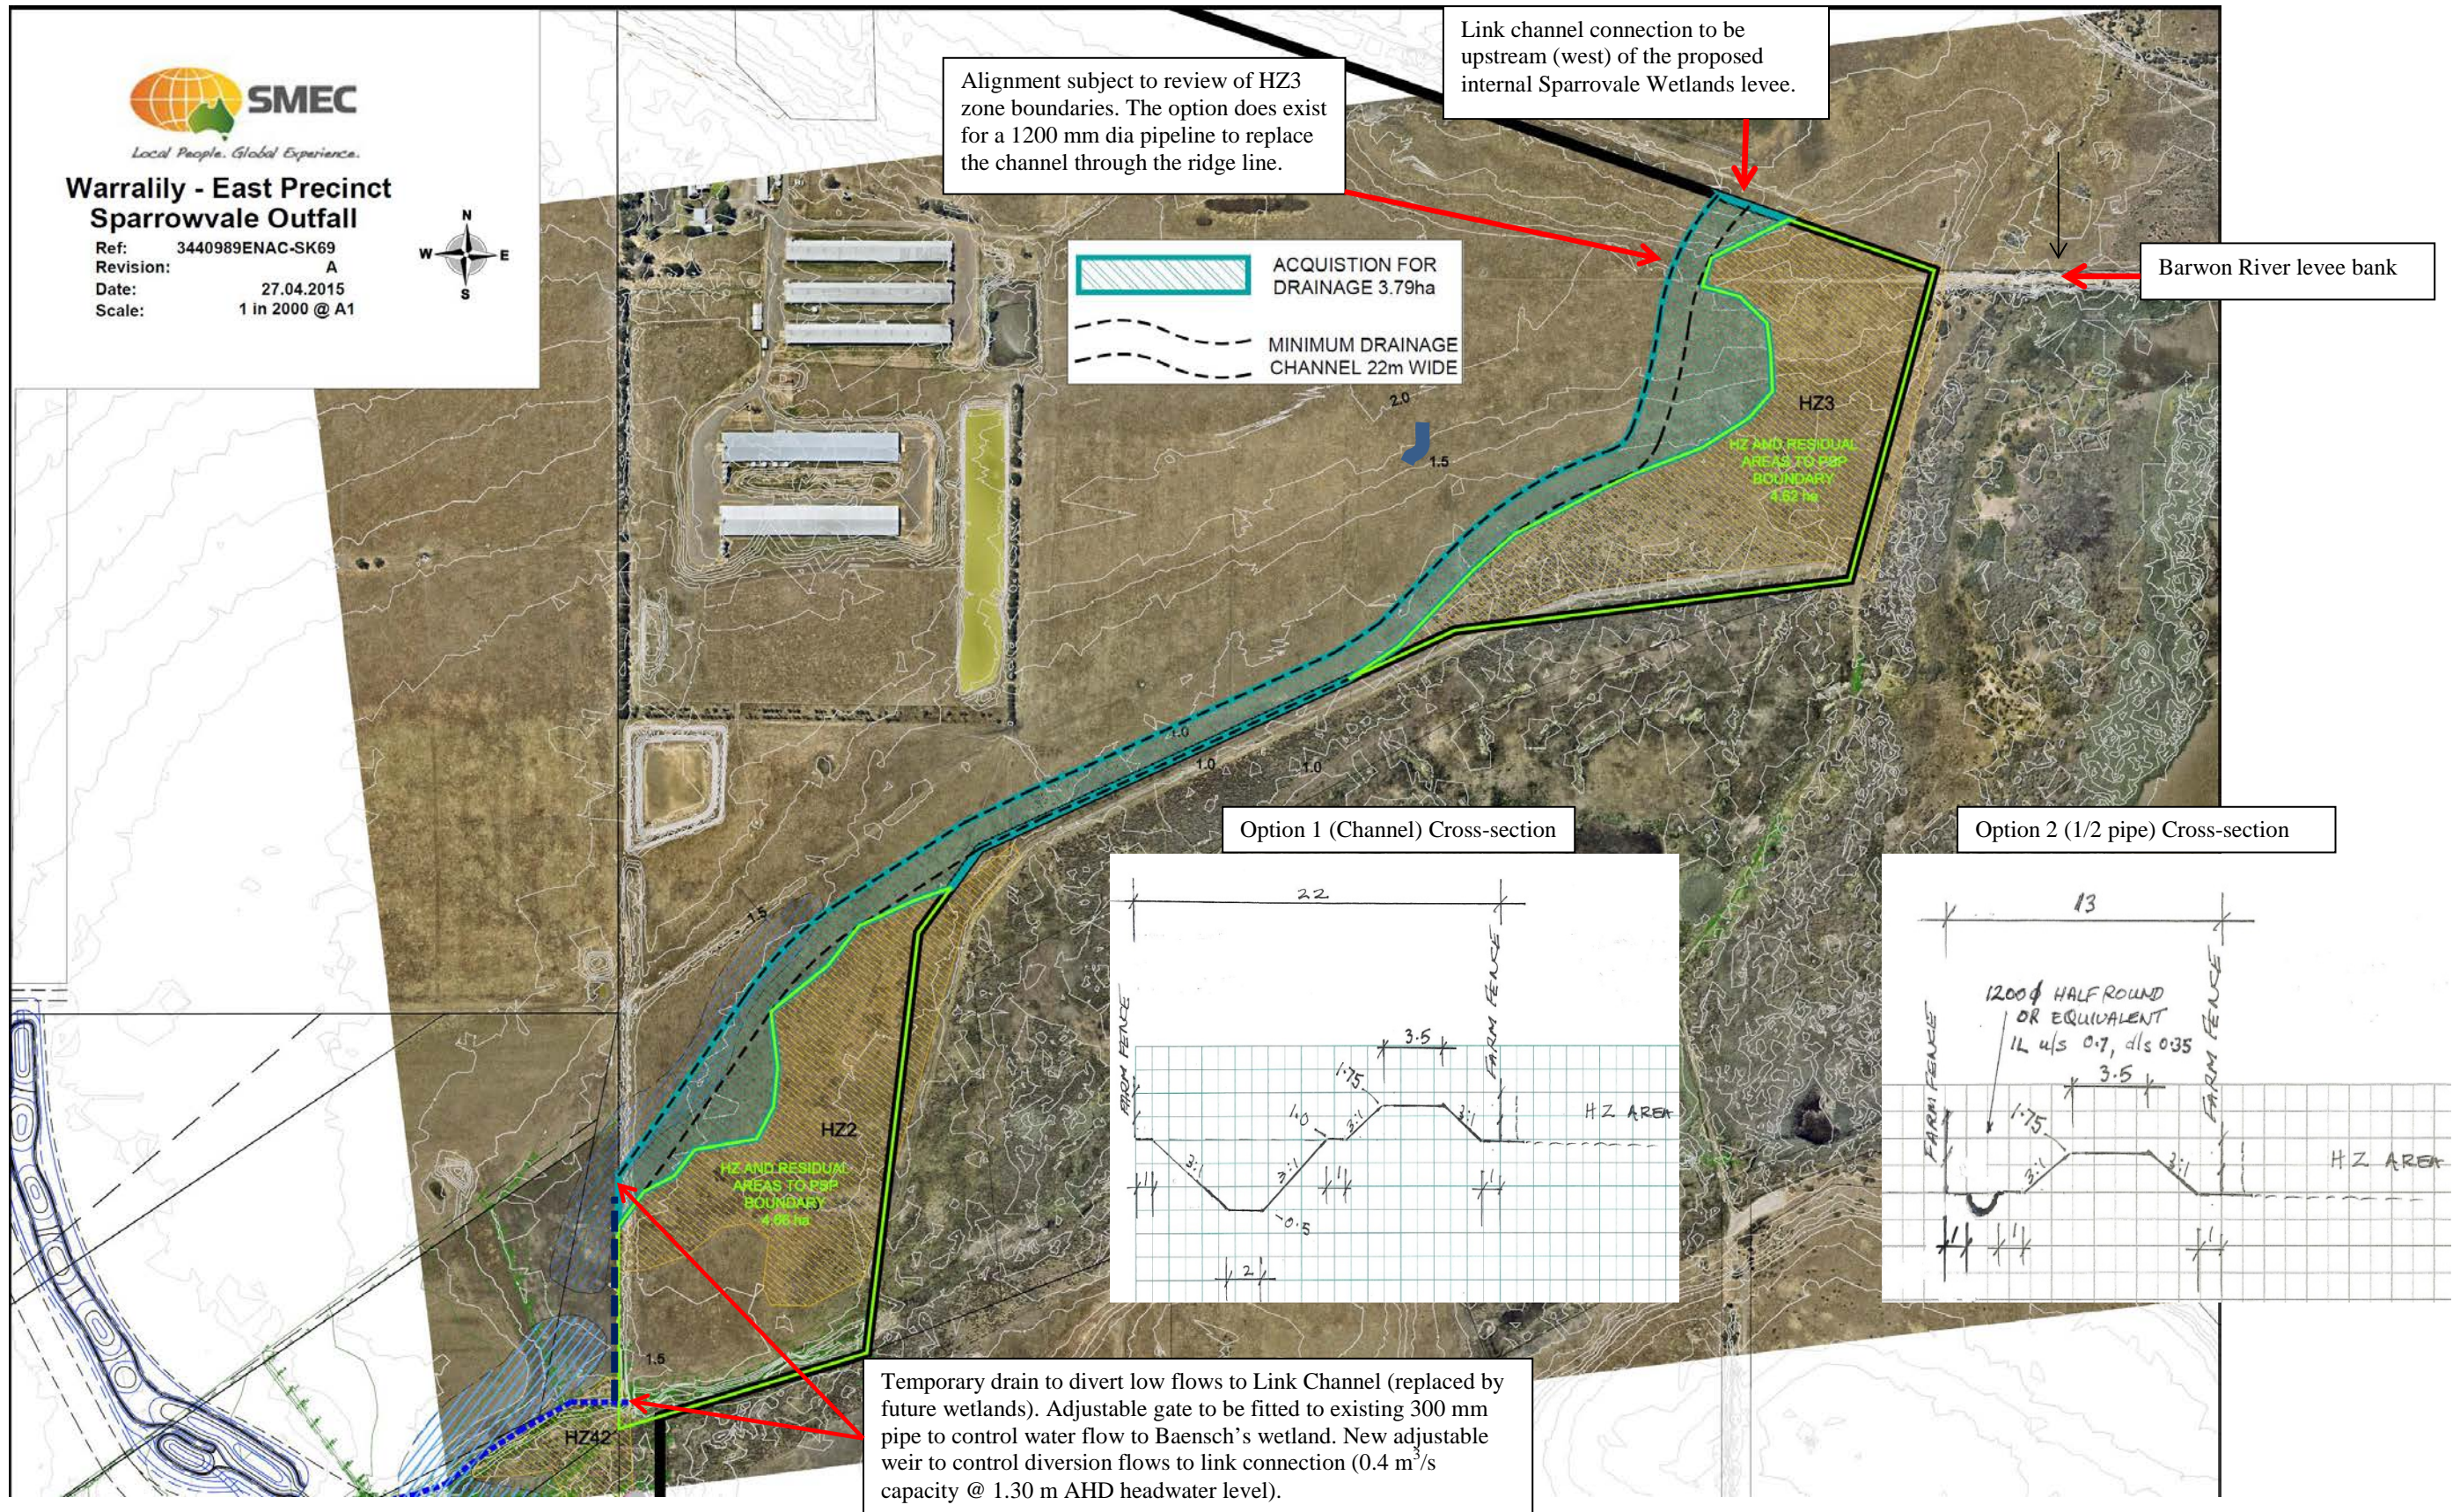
Proposed alignment and typical cross-section of Option 1 link channel and access bank (22 m strip between fencing). Option 2 would replace deep excavation with half-round 1200 mm pipe at higher inverts.
